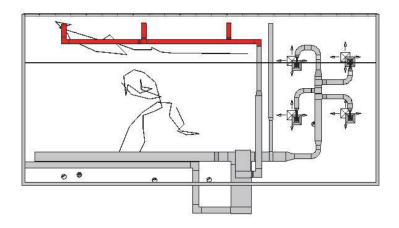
Floor Plan Generated in Revit Showing the Installed Ducts
